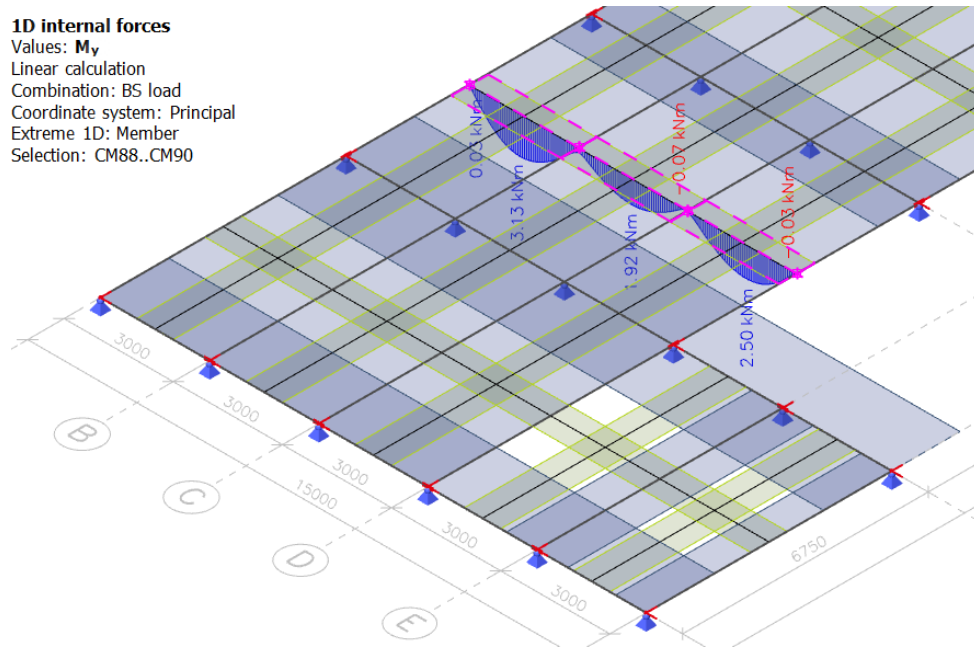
Short Span of Solid Slab Supported by Beam Size of 150 mm x 300 mm (Flexible Beam).
